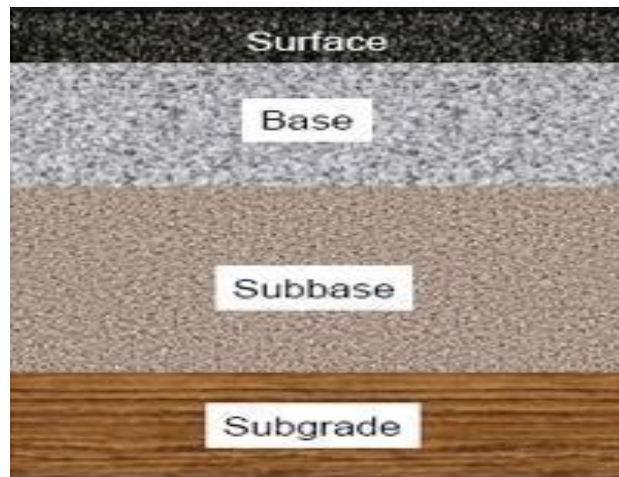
Road Pavement Structure (Mathew, 2009)
